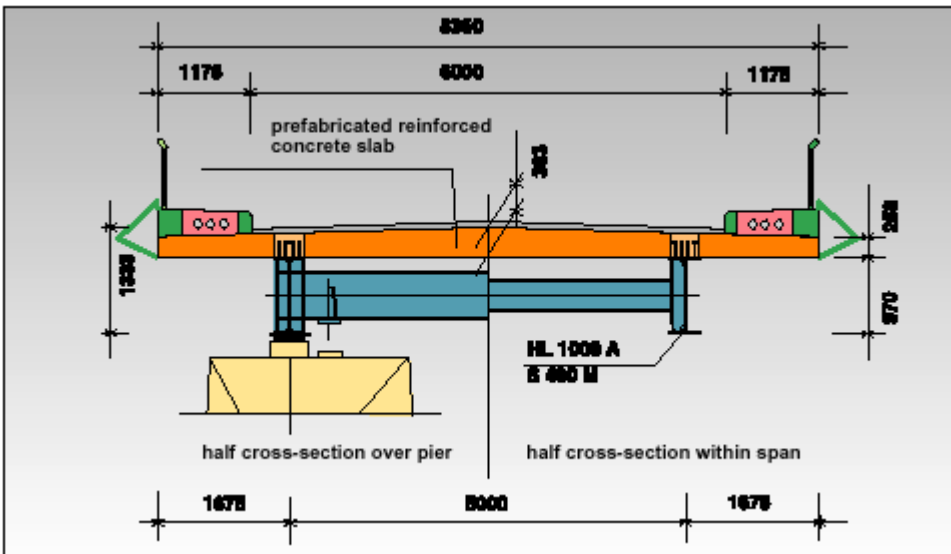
Example of twin girder arrangement (cross section of A16 over-bridge)
